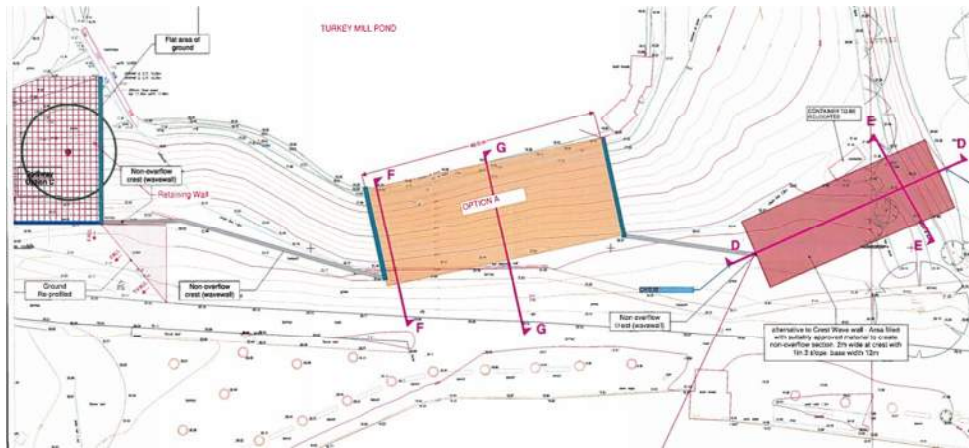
Plan - Low spot (gully) where Section D-D & E-E Shown
